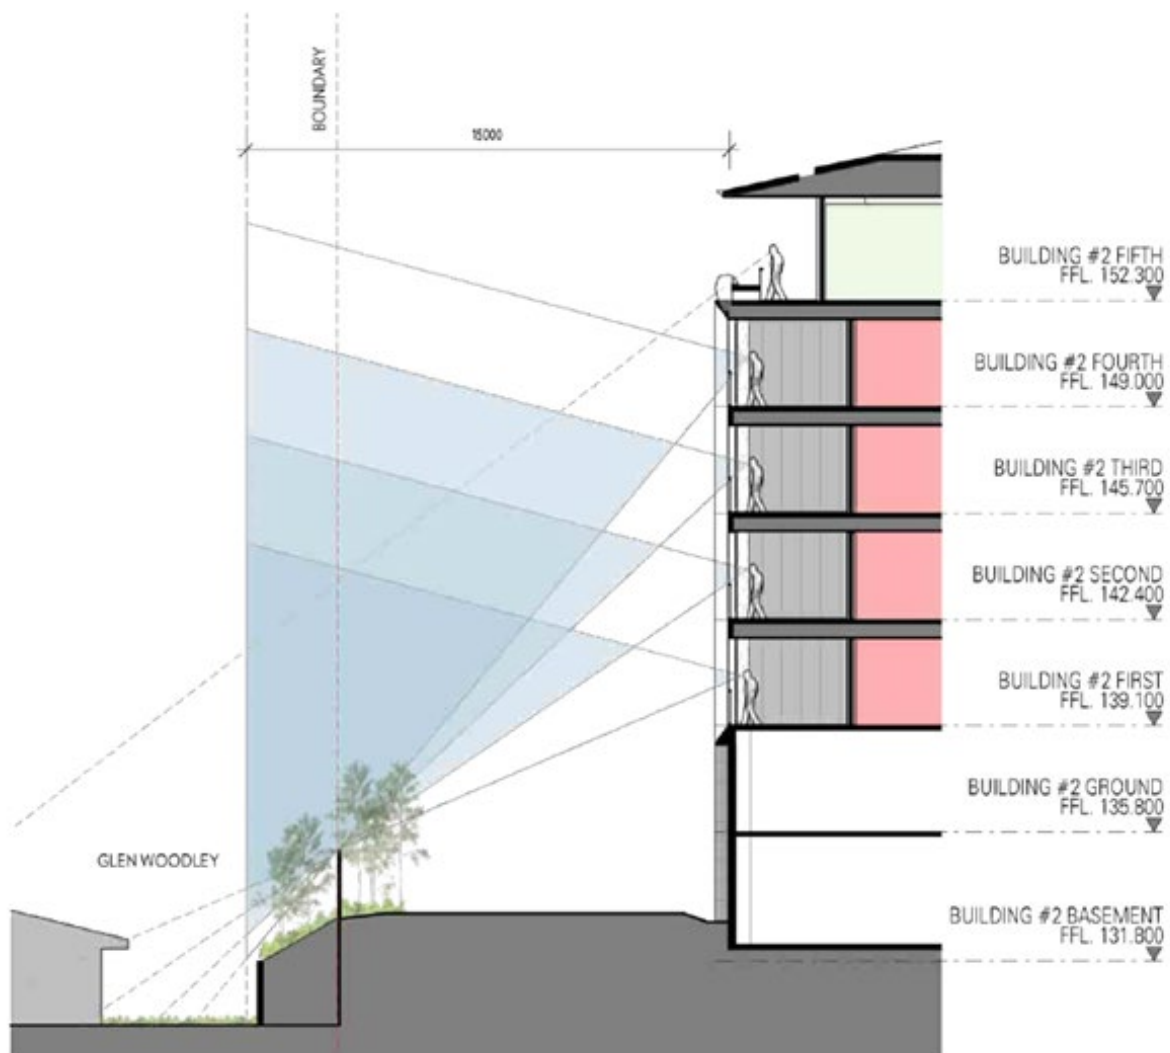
Direct Overlooking from Proposed Building 2 (excerpt from Walter Brookes Drawing No. DA13)
